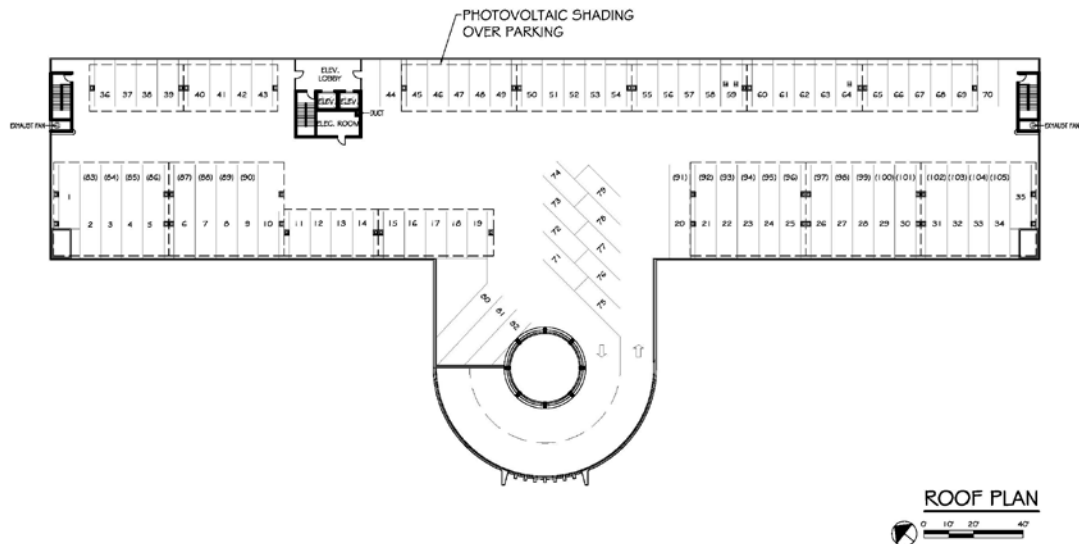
Rooftop Parking Plan w/ PV Shading Device Layout²⁸⁶
